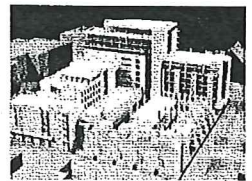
View of townhouses and retail/housing development on north side of East Main Street between South Butler and South Hancock Streets.
